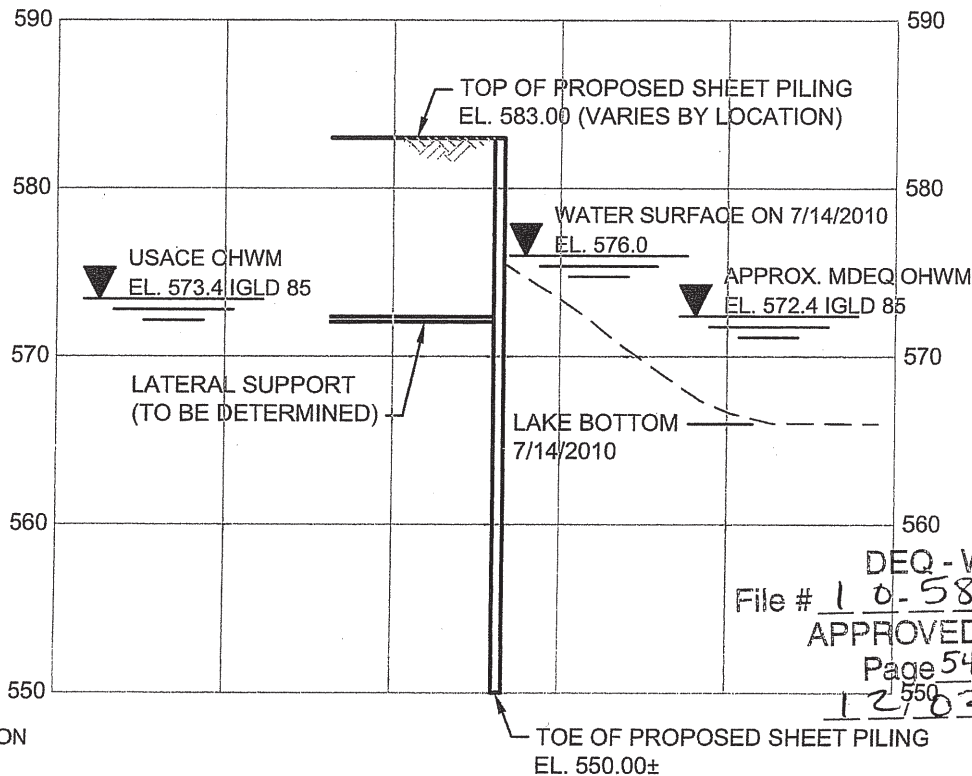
C LAKE ERIE CONSTRUCTION AREA PIPE DREDGING SECTION 'B' DETAILS
